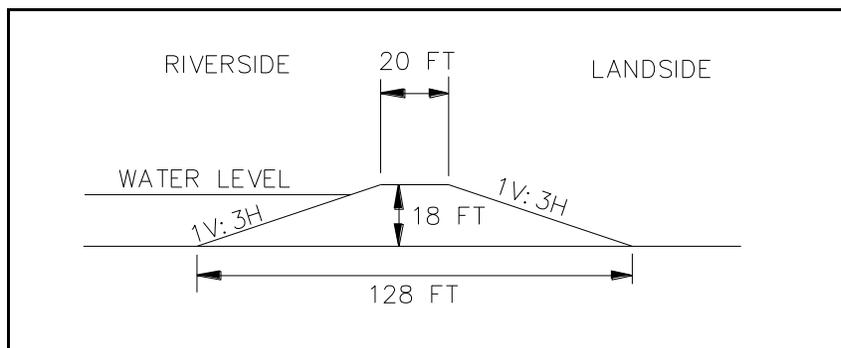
Typical levee cross section on Sacramento-San Joaquin River Delta.
